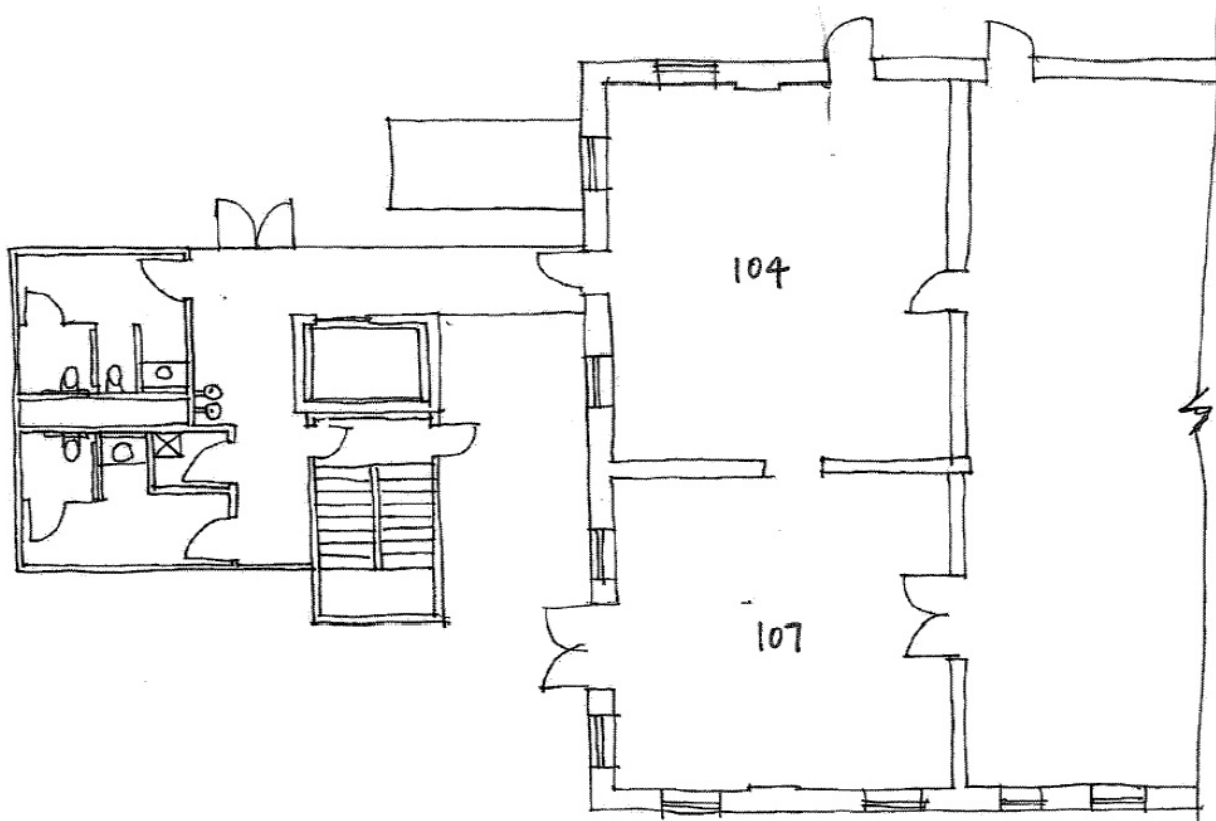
Exhibit Plan, Second Floor of Union Building, Alternative 1 (Office of Krister Olmon)
